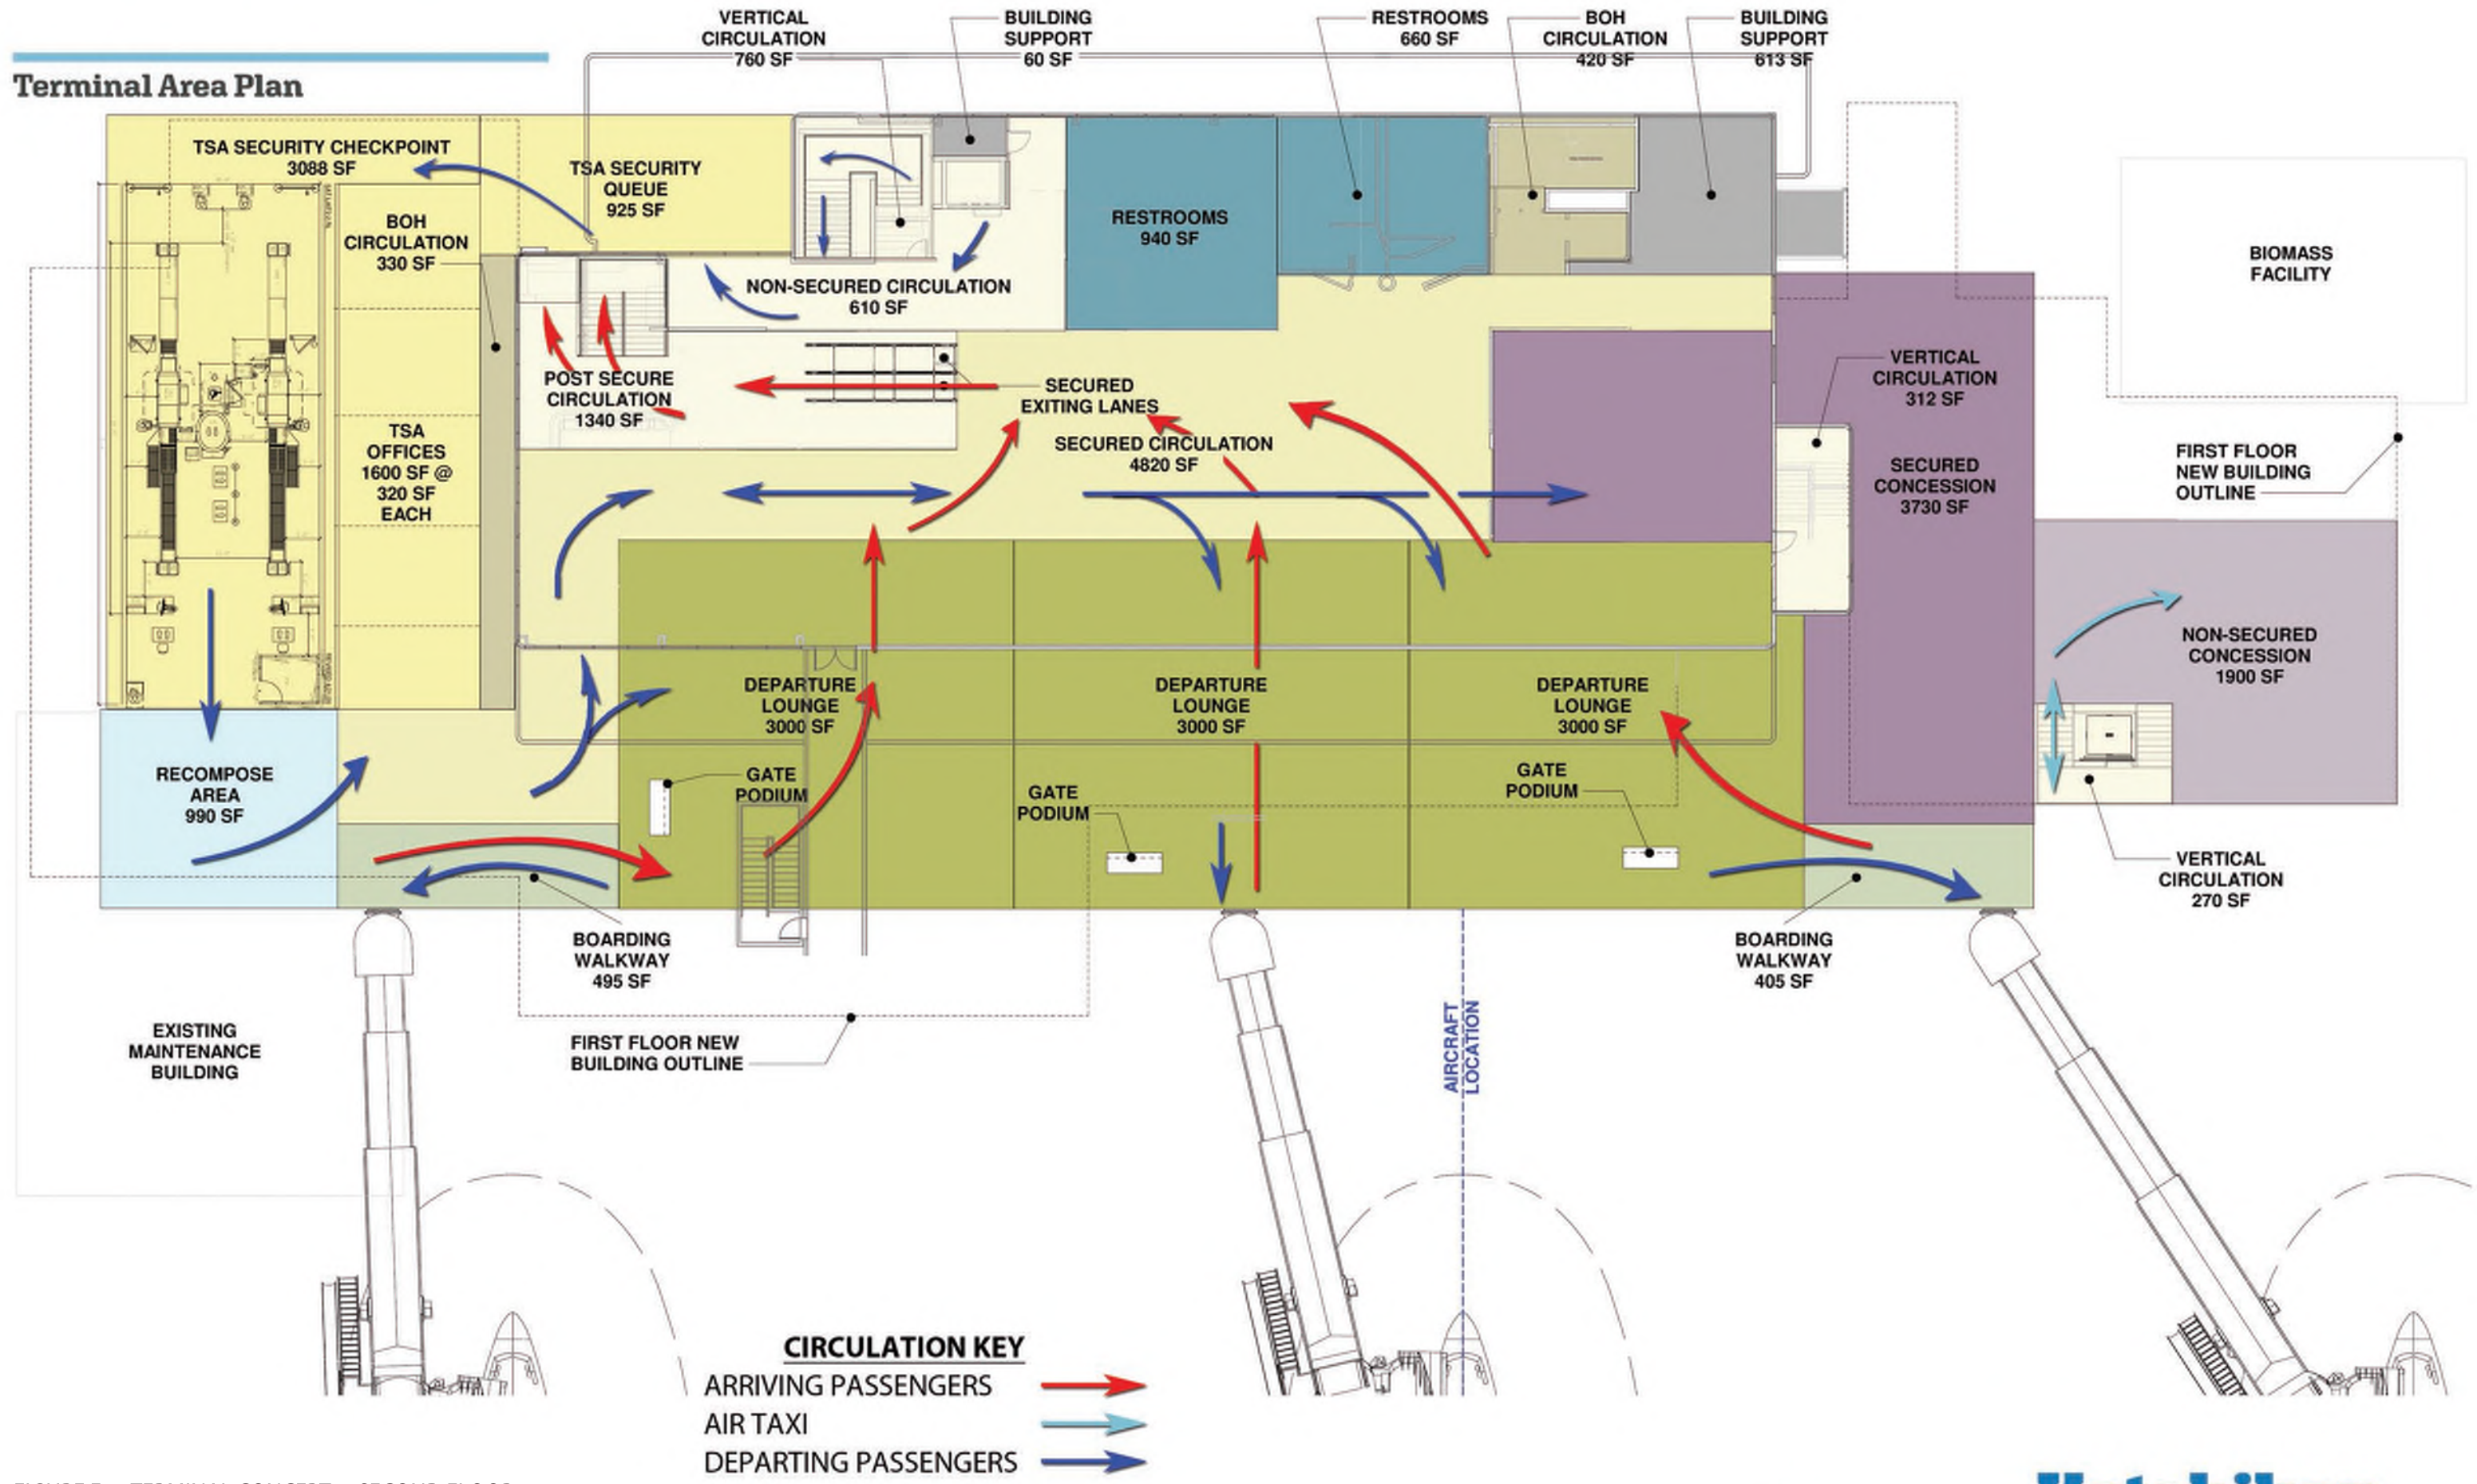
TERMINAL CONCEPT 2, SECOND FLOOR
